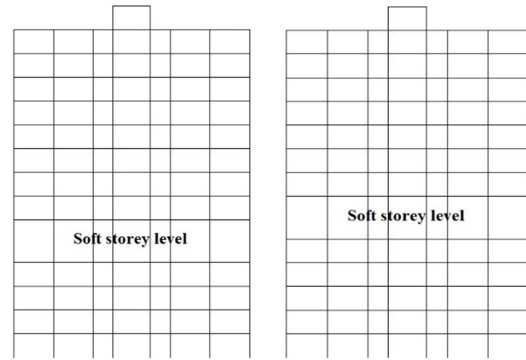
Elevation of (M-5). Figure 8 Elevation of (M-6).
